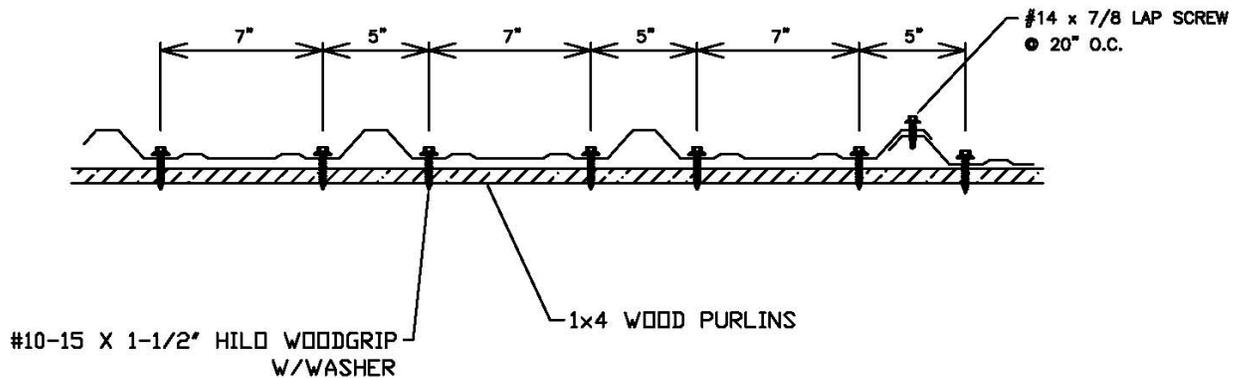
Fastener Pattern – Minimum 26 Gauge PBR Metal Roofing Panels
